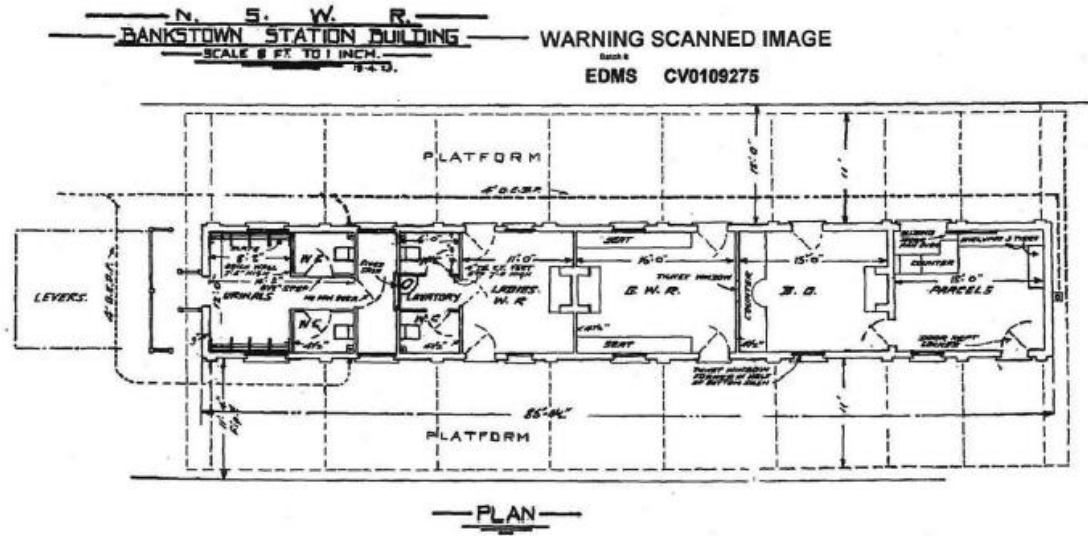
1923 plan of the platform building and parcels office. Source: Railcorp archive.
